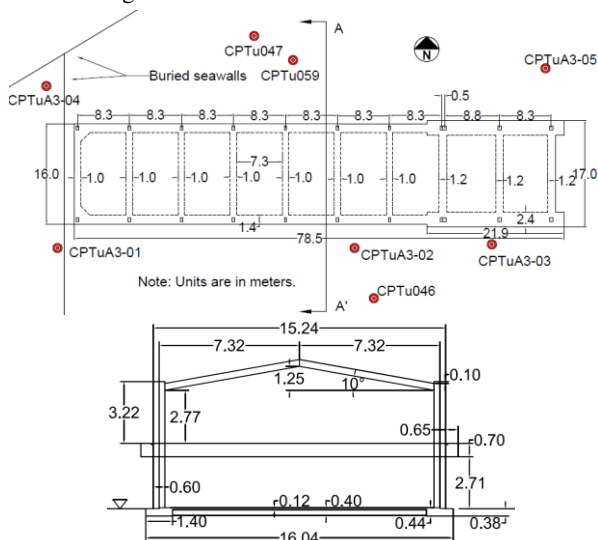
Plan view of the foundation of the CPH building with surrounding CPTs and a typical structural frame (section A-A') of the office section of the building.
